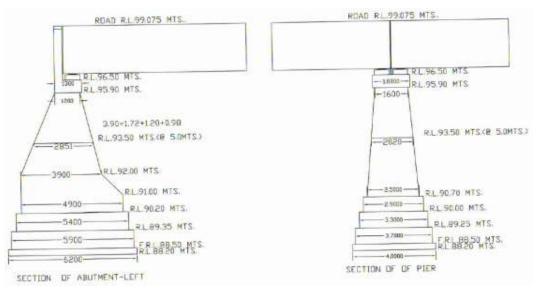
Typical Cross section – Plate 6 (Mass Concrete Pier and Abutments)
